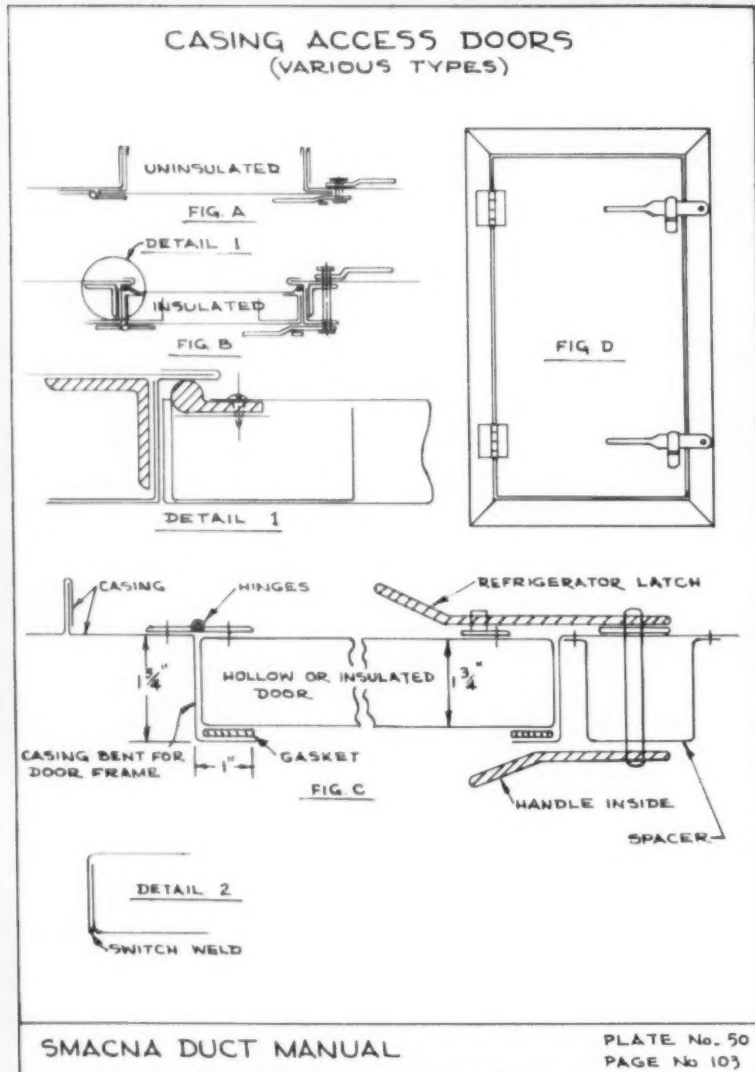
FIG. A - CONSTRUCTION OF AN UNINSULATED DOOR
